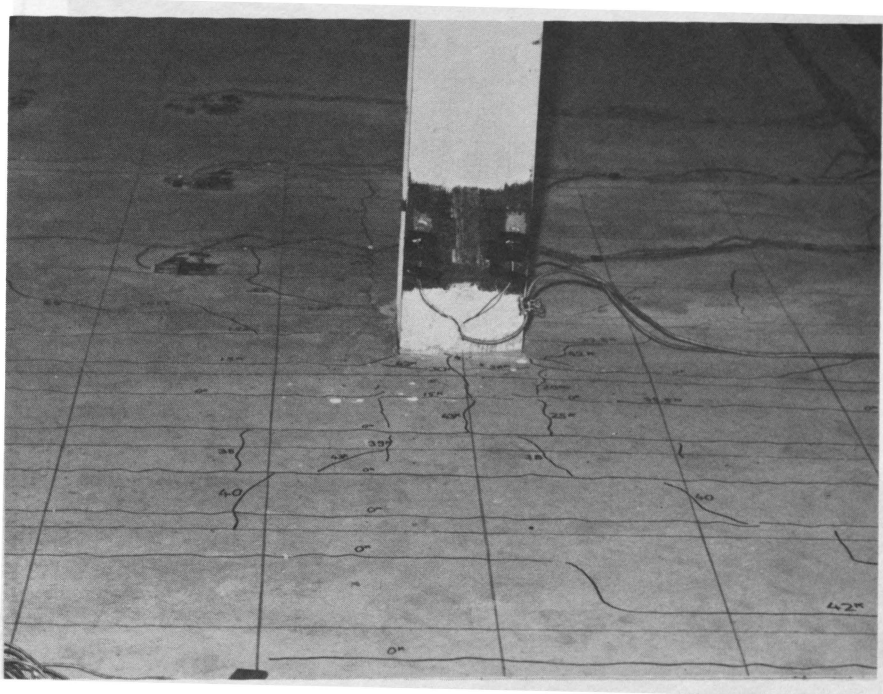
Slab Cracking on Windward Side of Center Column of CA-1
